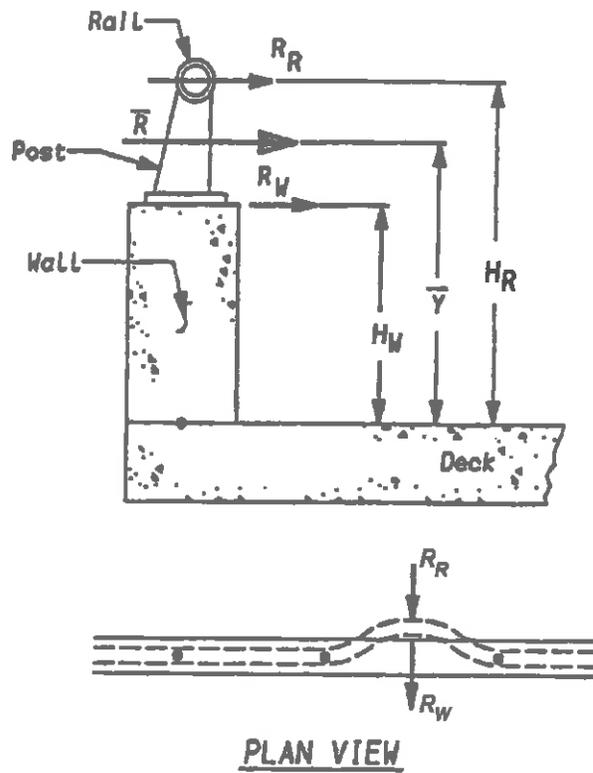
Concrete Wall and Metal Rail Evaluation—Impact at Midspan of Rail
